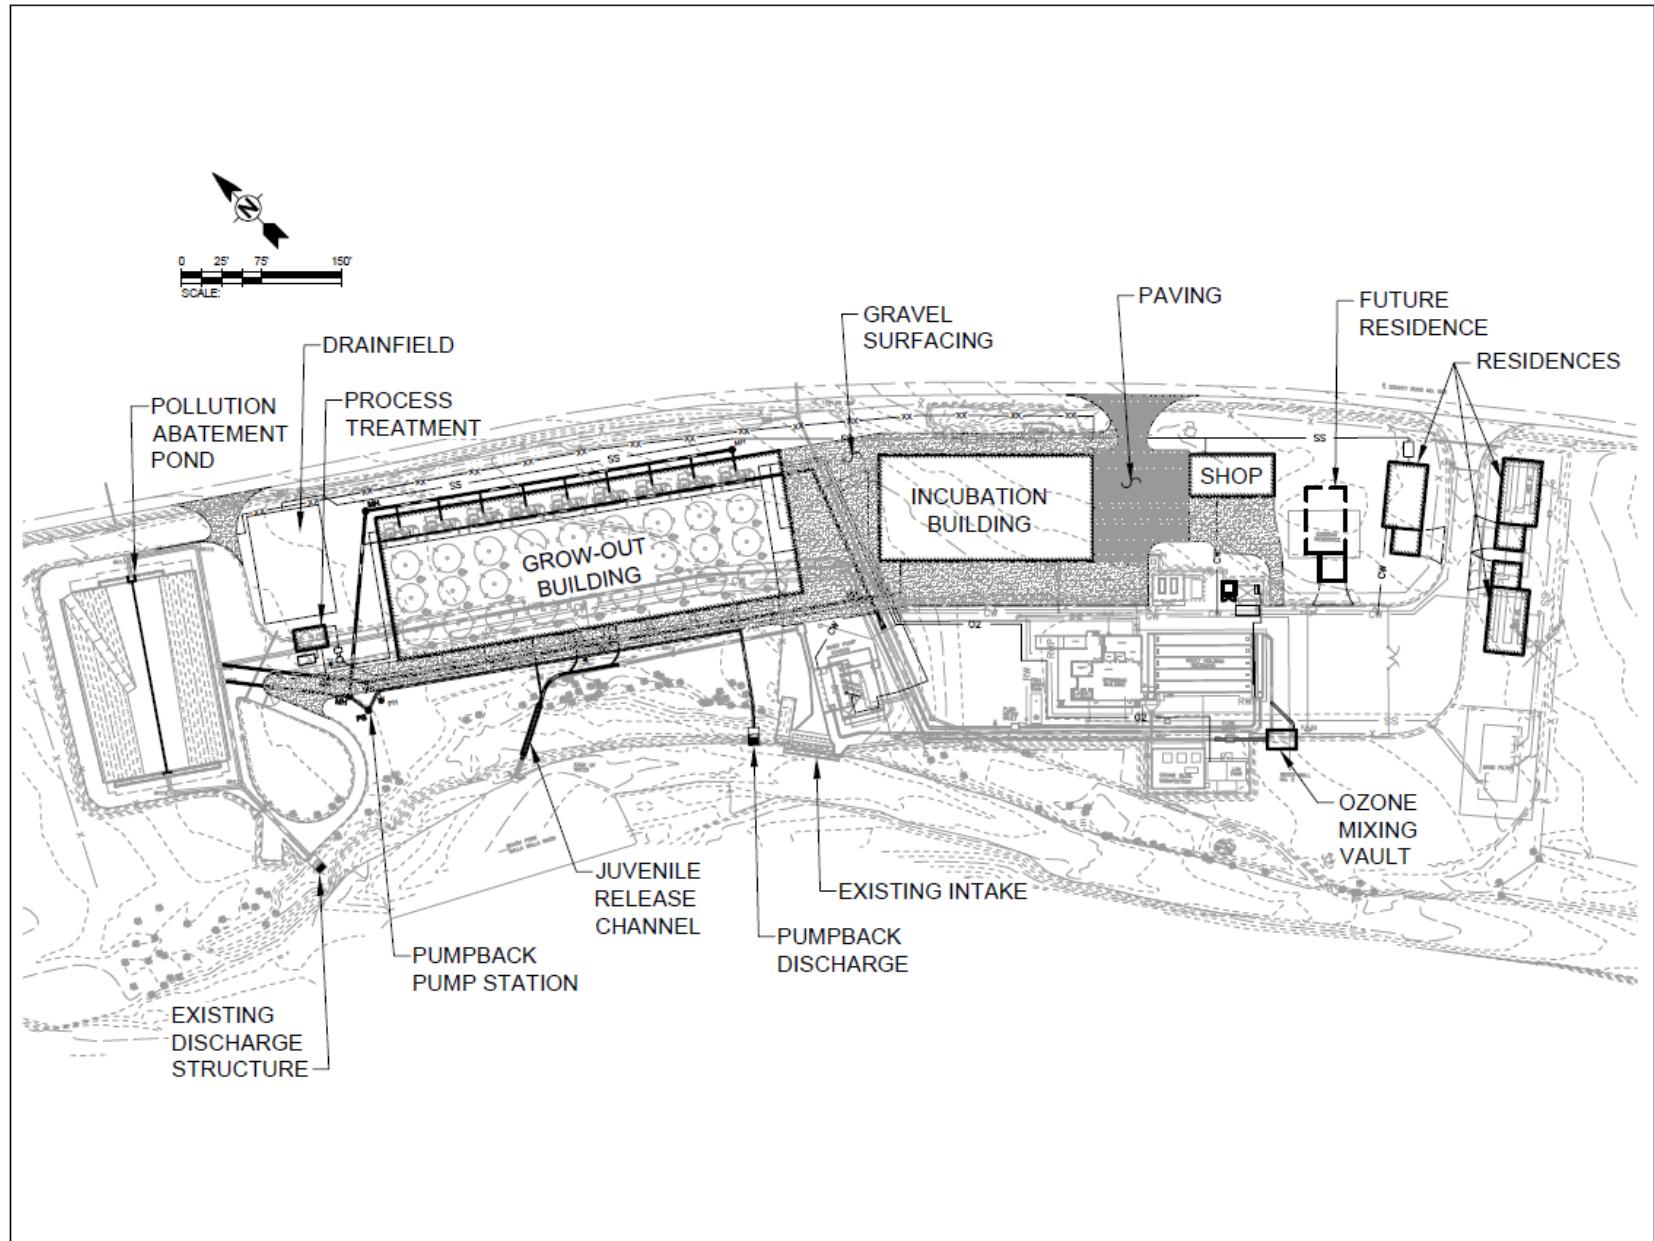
Proposed New Facilities at South Fork Walla Walla Hatchery Site: Alternative 2
